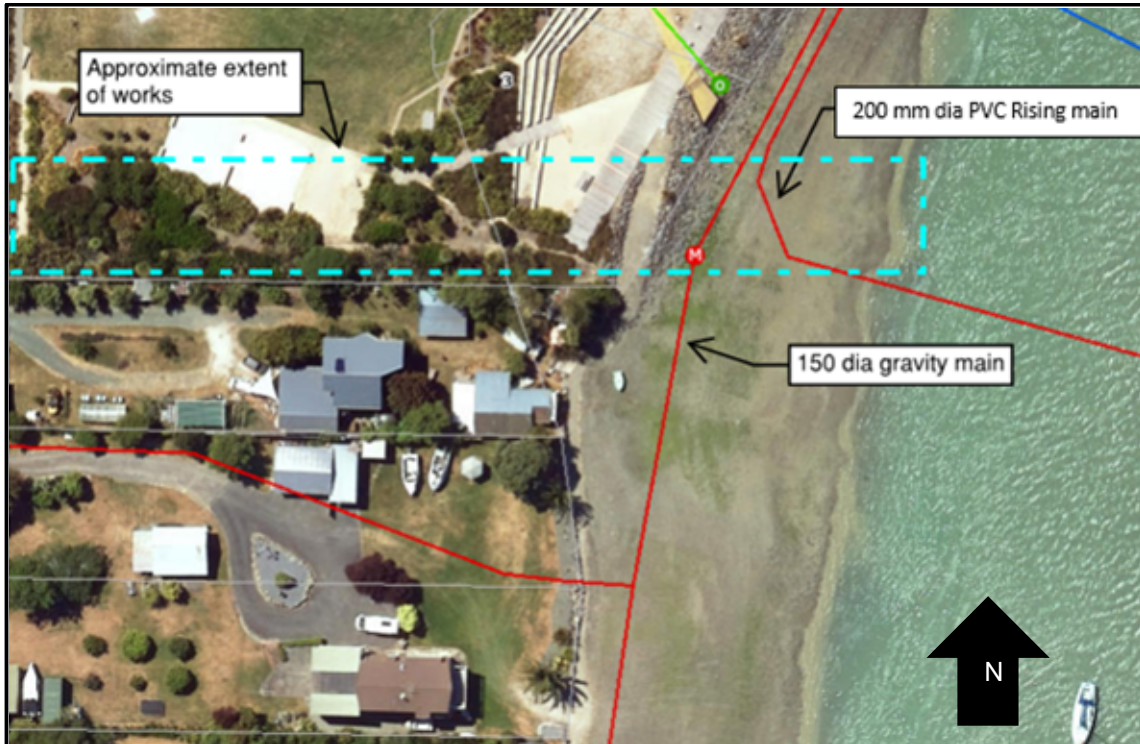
Location plan & existing wastewater infrastructure. Not to scale.
